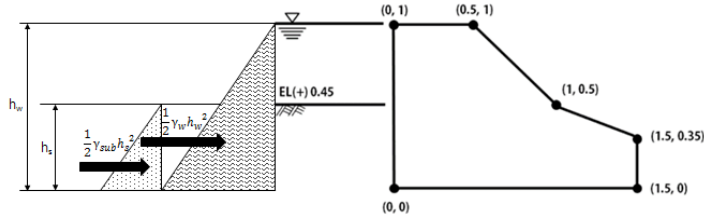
The Concept of loading with Earth and Hydraulic Pressure
